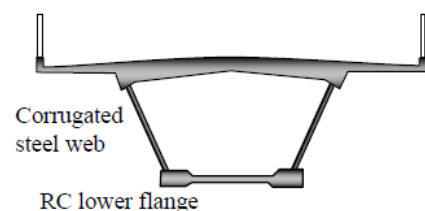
Schematic representation of bridge girders with corrugated steel web.
